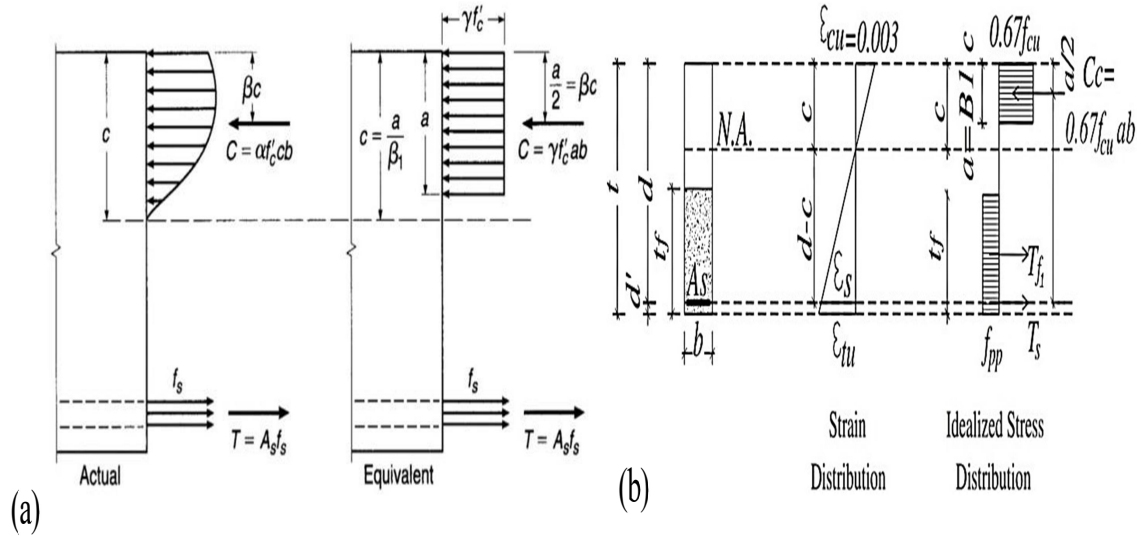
Stress distribution of concrete beam having steel rebars: (a) for plan concrete by [32], and (b) for fiber reinforced concrete by [33]
